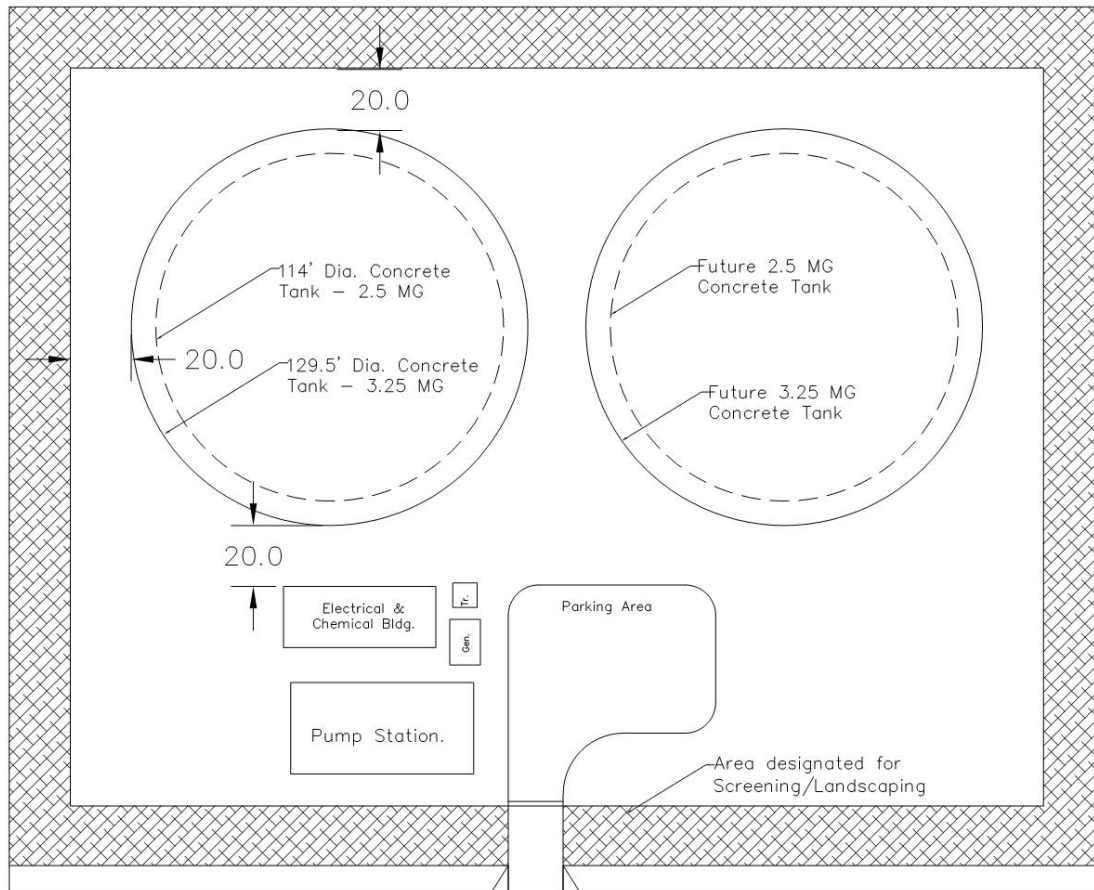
Typical Site Configuration for 2.5 or 3.25-MG Concrete Tank
